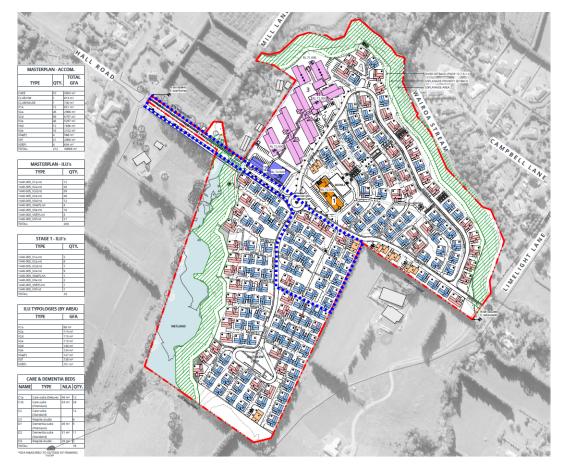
Overall site plan (blue dotted line represents the approx. extent of the Stage 1 buildings and the Hall Road extension)
